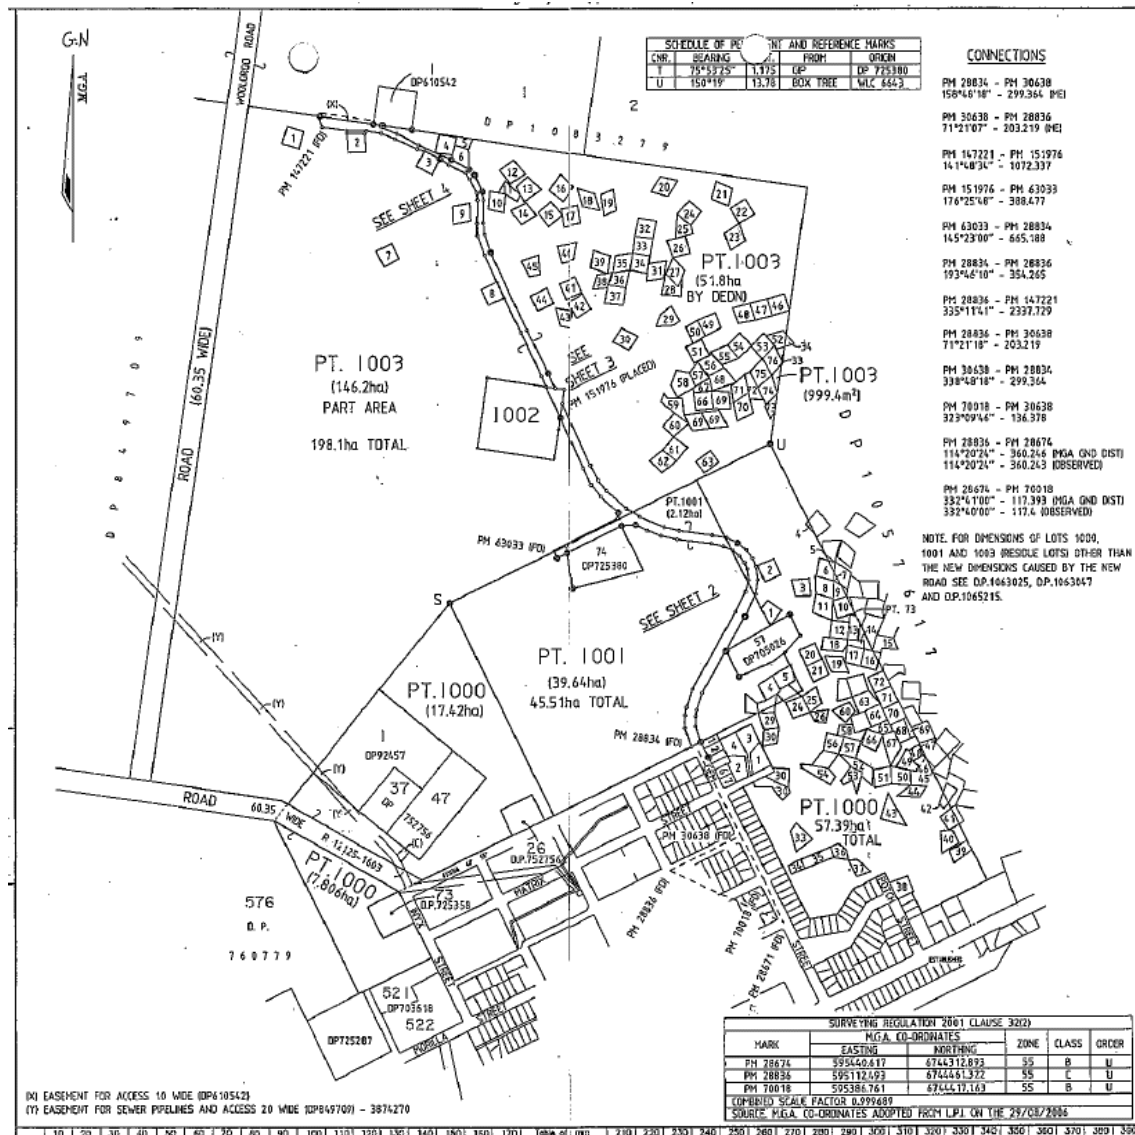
Road reserve proposed to be created through new lots 1001, 1002, 1003.
